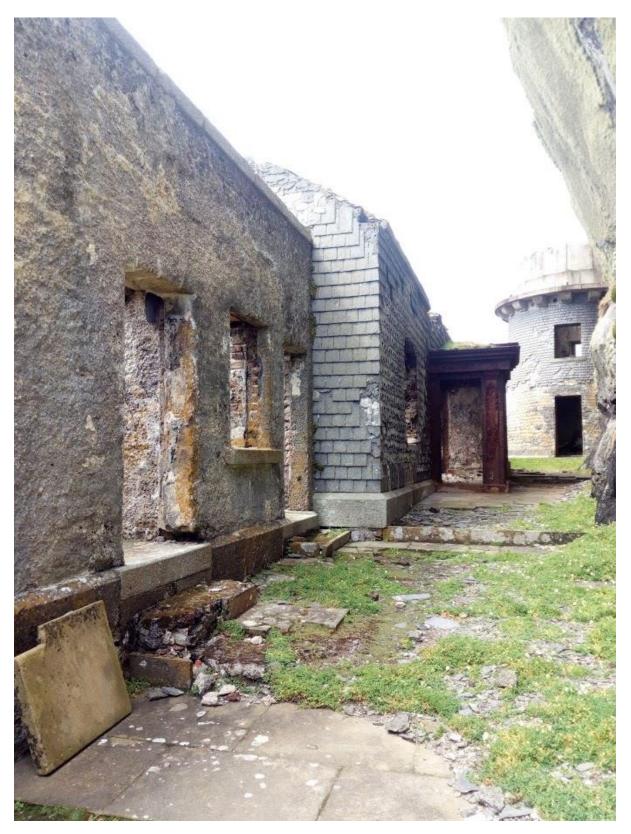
View of ancillary buildings, cottages and lighthouse tower.
